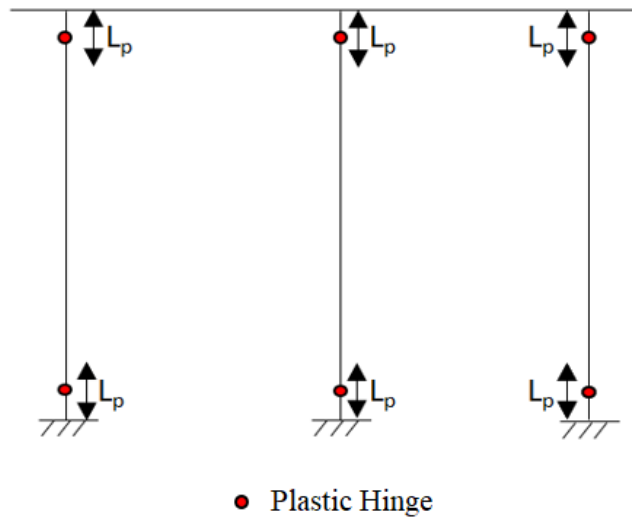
Column plastic hinge locations in bridge transverse direction
